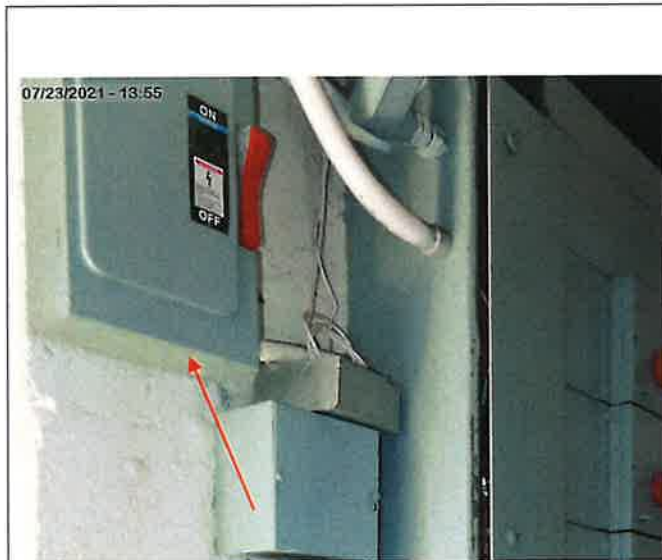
Disconnect switch not labeled to identify the load it serves (North building, roof cooling tower mechanical room)(Item #10.a)
